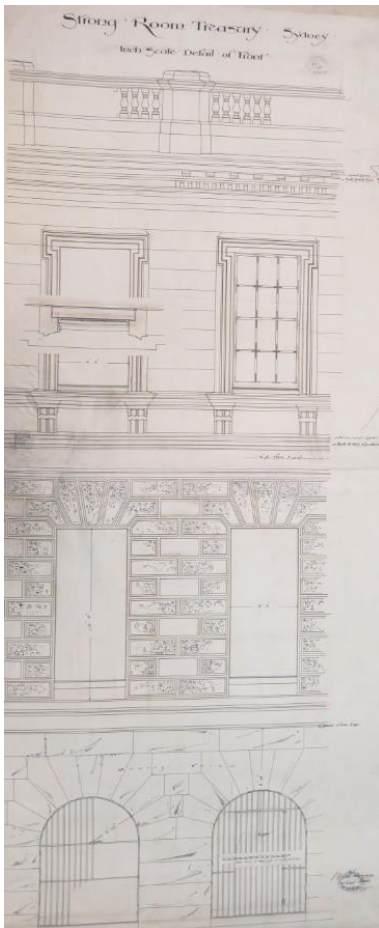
Strong Room Treasury: Detail of stone façade similar to as constructed
